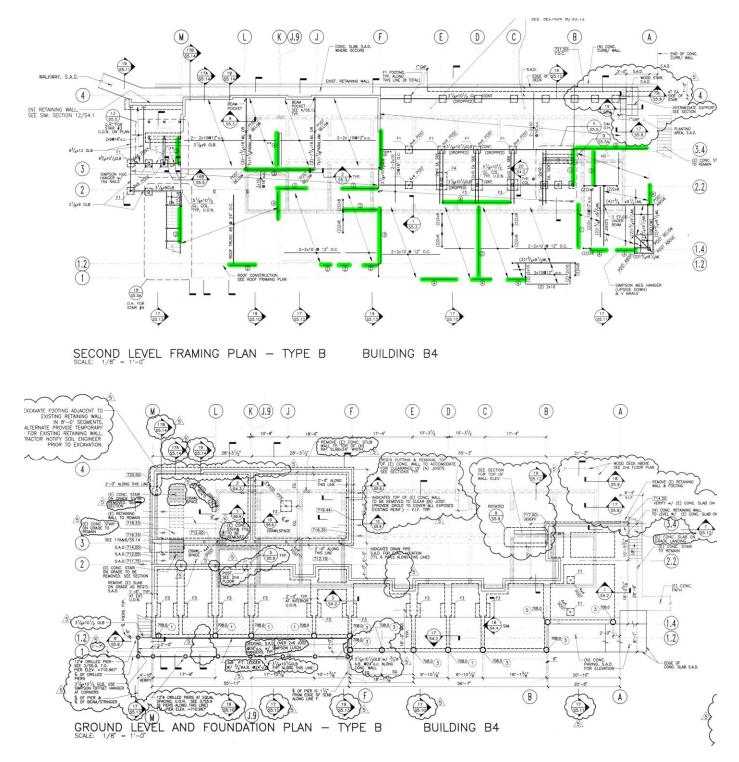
Structural Foundation, Ground Level, and Second Level Plan
